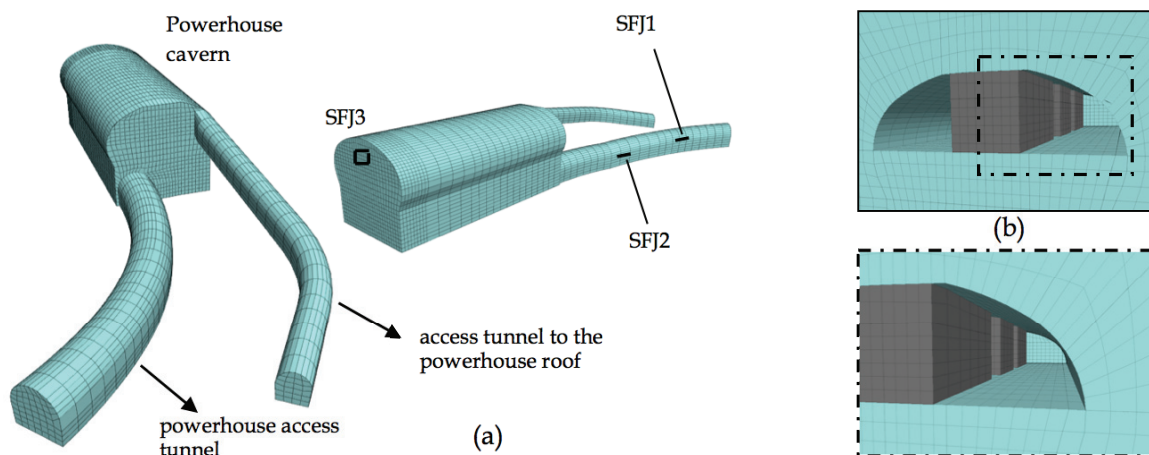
Underground excavations: (a) perspective of the powerhouse and access tunnels; (b) detail of the excavation of the powerhouse roof.
